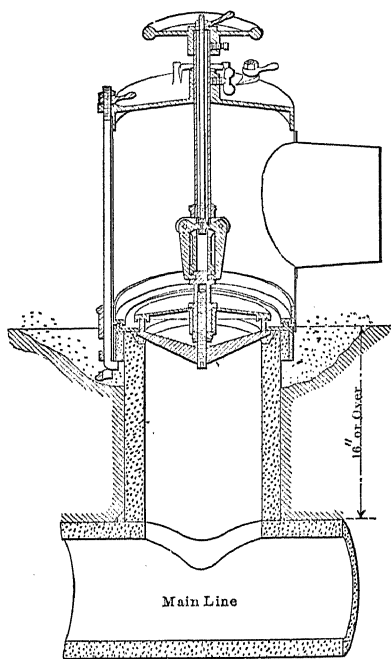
Cross section of stand pipe, alfalfa valve, and portable hydrant.
